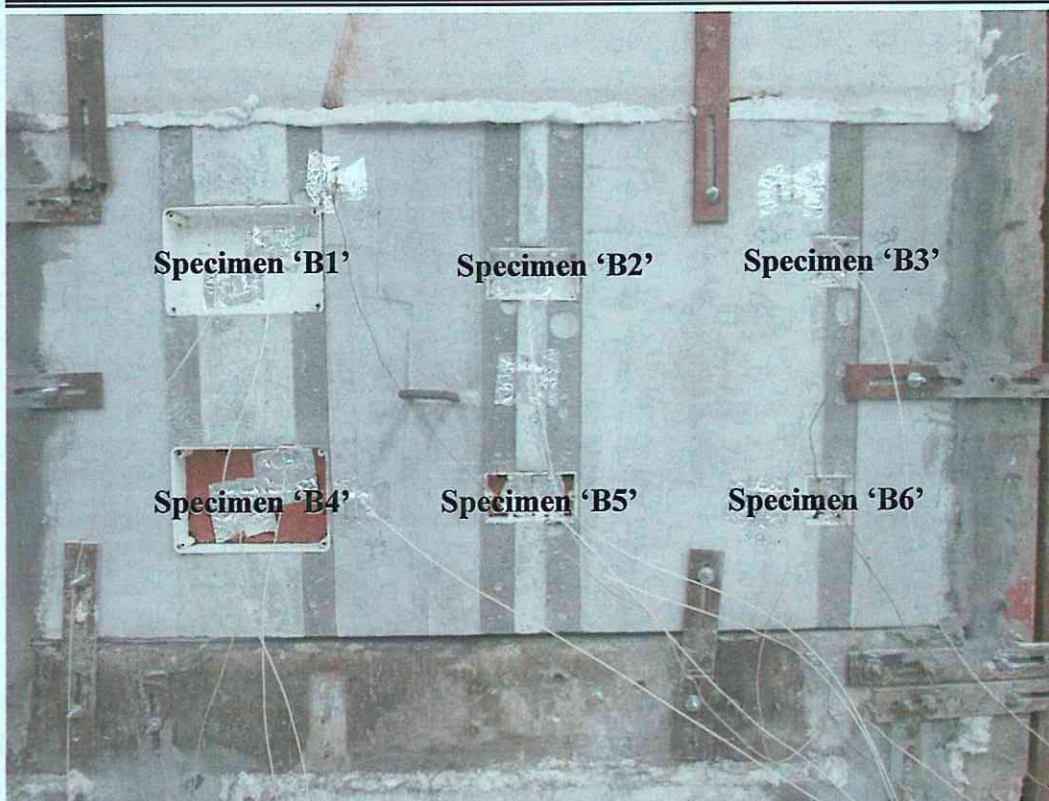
The unexposed surface of the specimen 'B' before the test.
